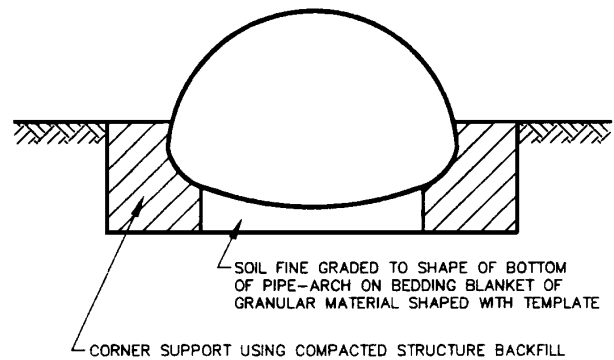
Foundation Treatment for Support of Corner or Side Plate Pressures
